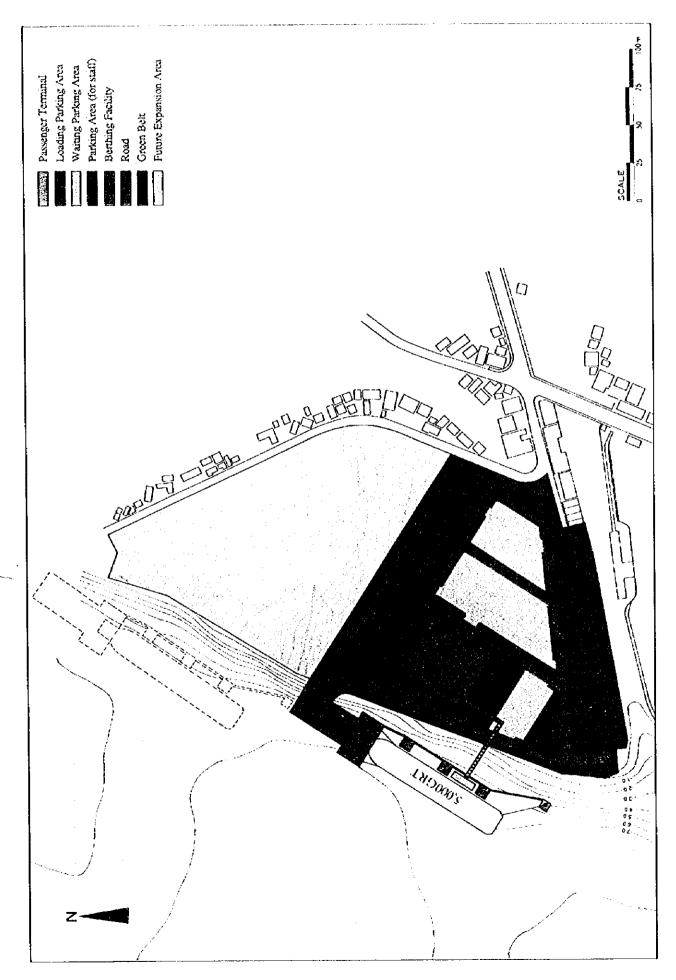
Layout Plan of Banjarmasin Ferry Terminal
